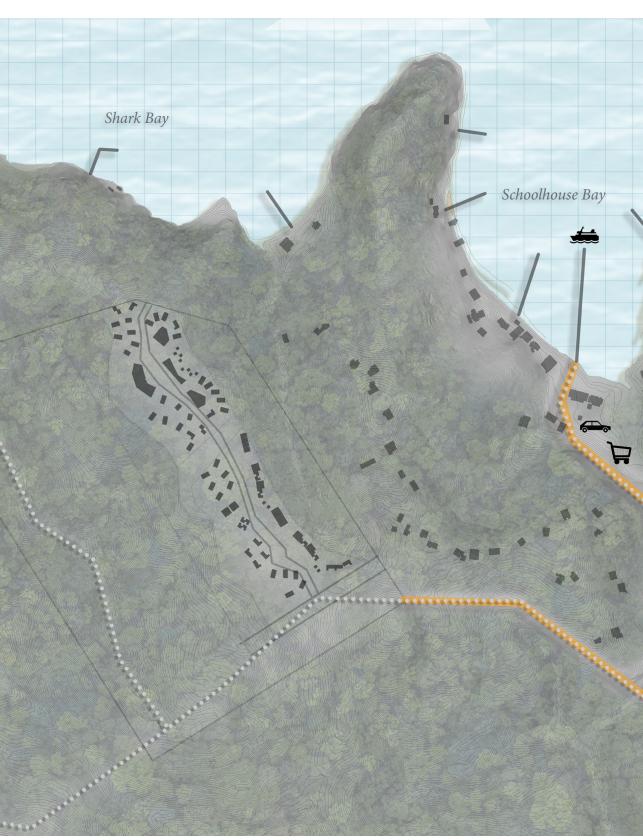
; Site Plan of Project Two at 1:5000, showing context of design to existing baches, roads, walking tracks, sea, and amenities
